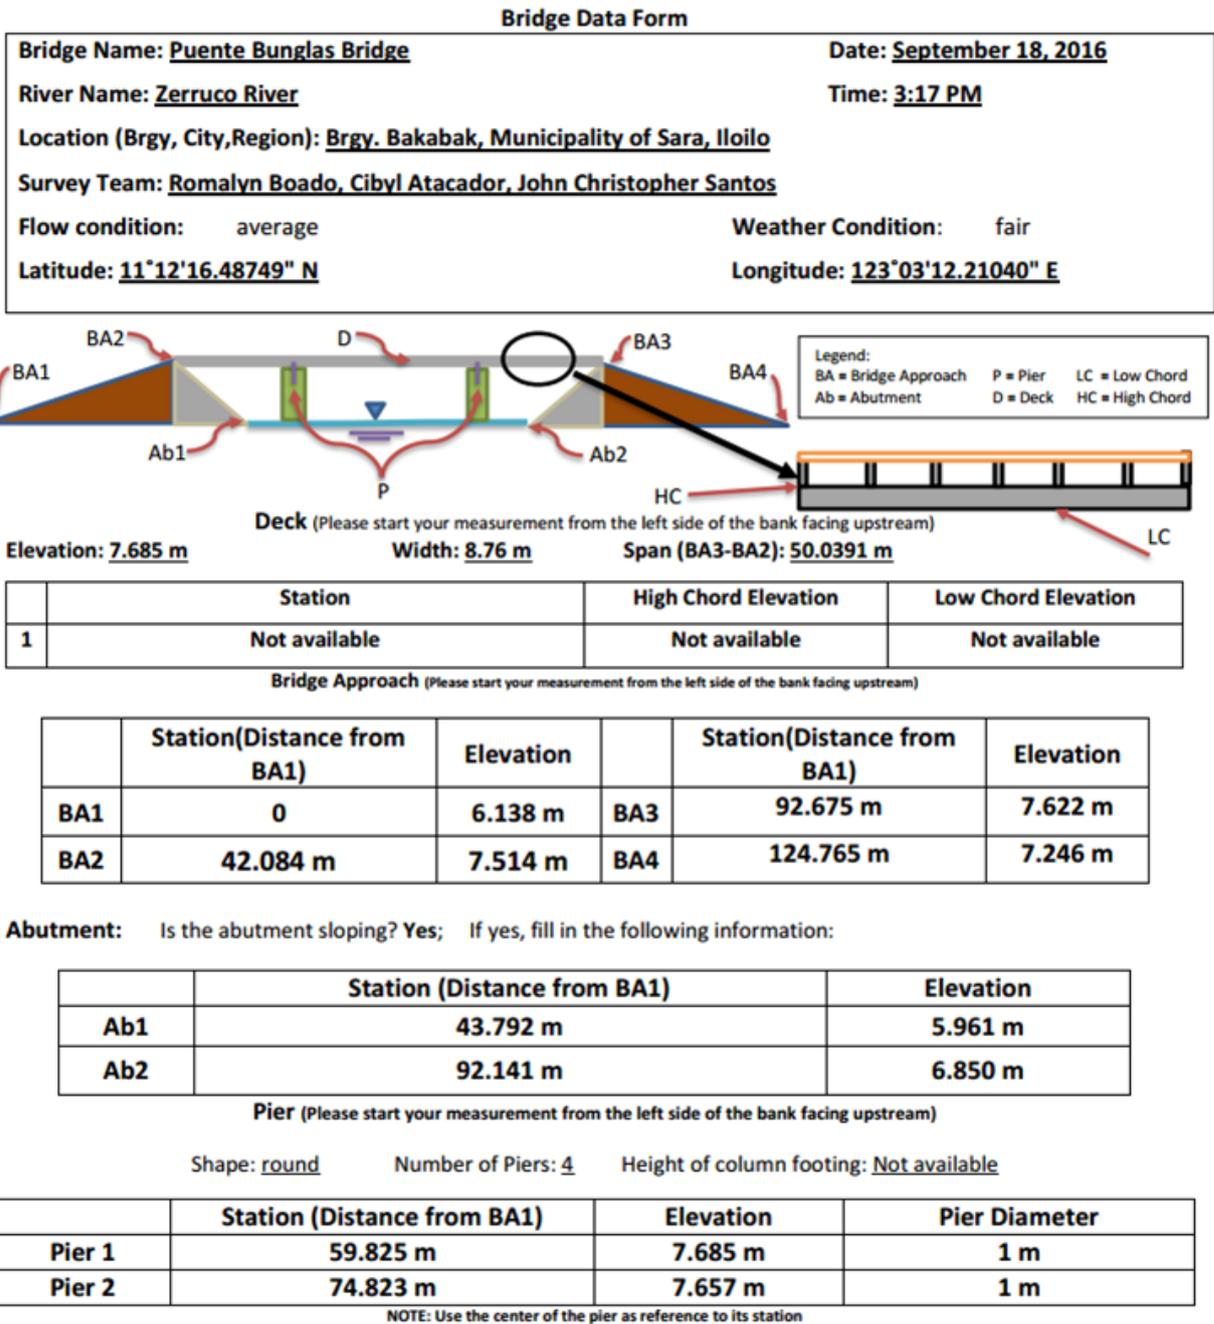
Bridge as-built form of Puente-Bunglas Bridge
